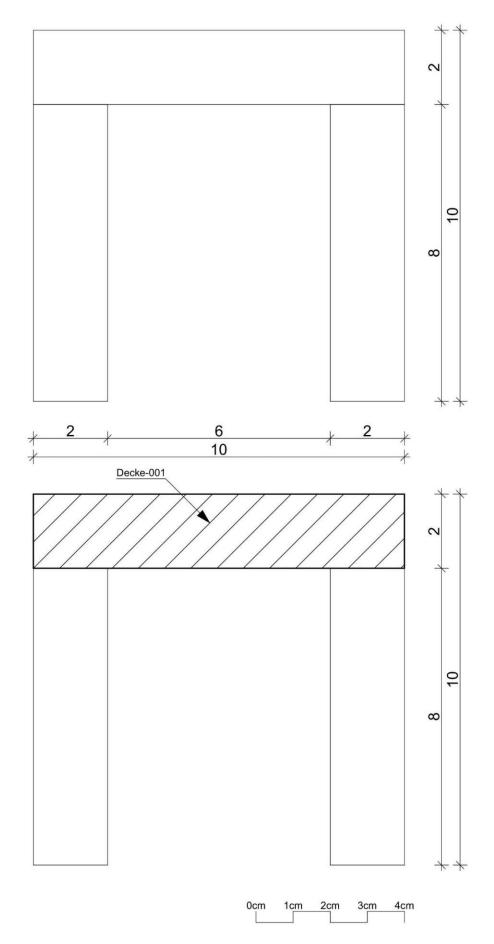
Elevation of all sides(top) (double symmetrical structure) and section A-A (bottom) M 1:1
